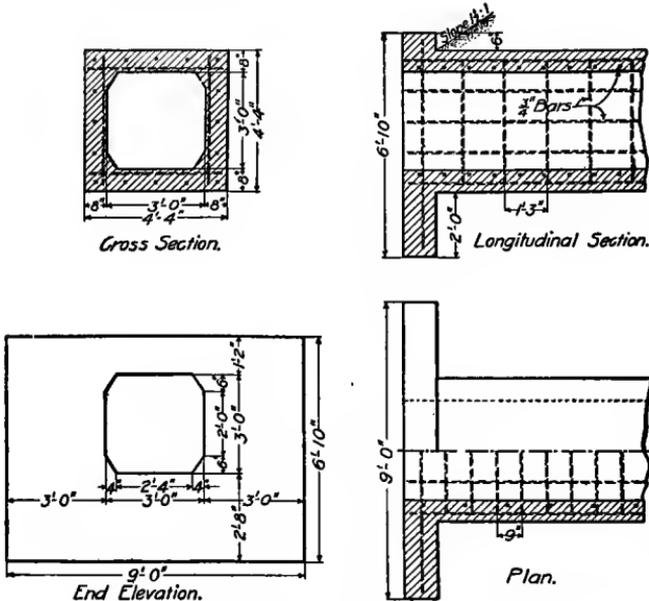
K.-C., M. & O. RY. BOX CULVERT.
